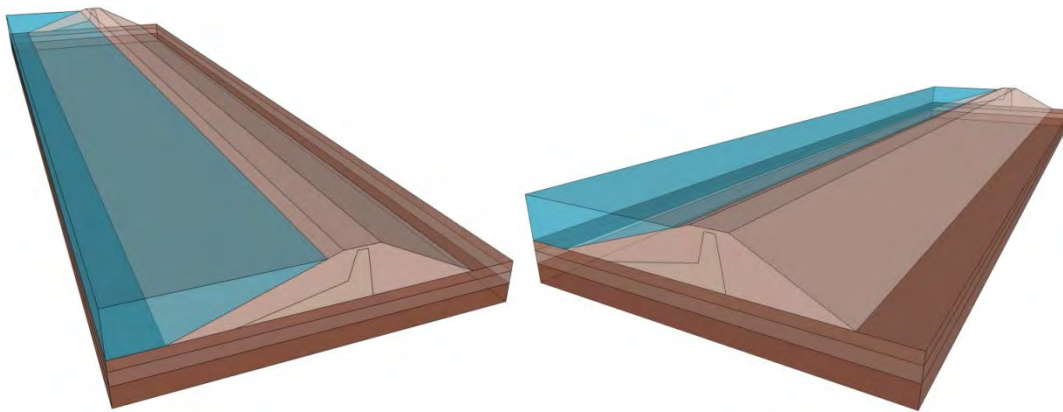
3-D Model Views (Block Views) of the Carsington Earth Embankment Dam, based on provided dimensions (On exact Scale).
